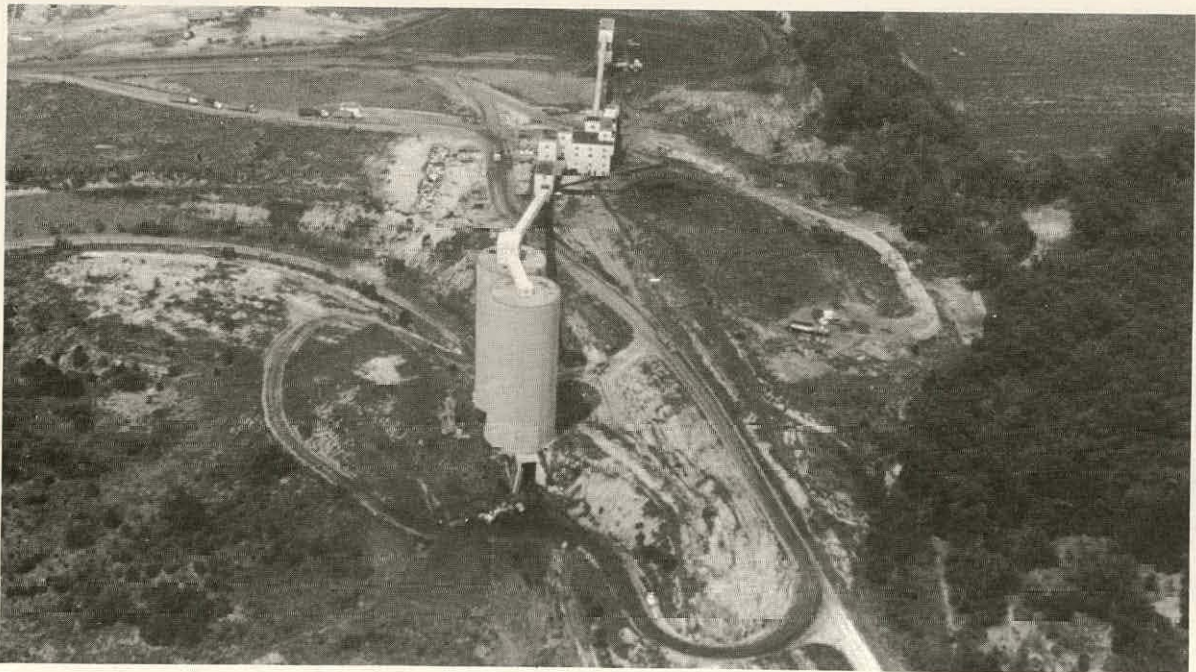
Universal Mine Processing Plant, Storage Silos and Rail Connection
